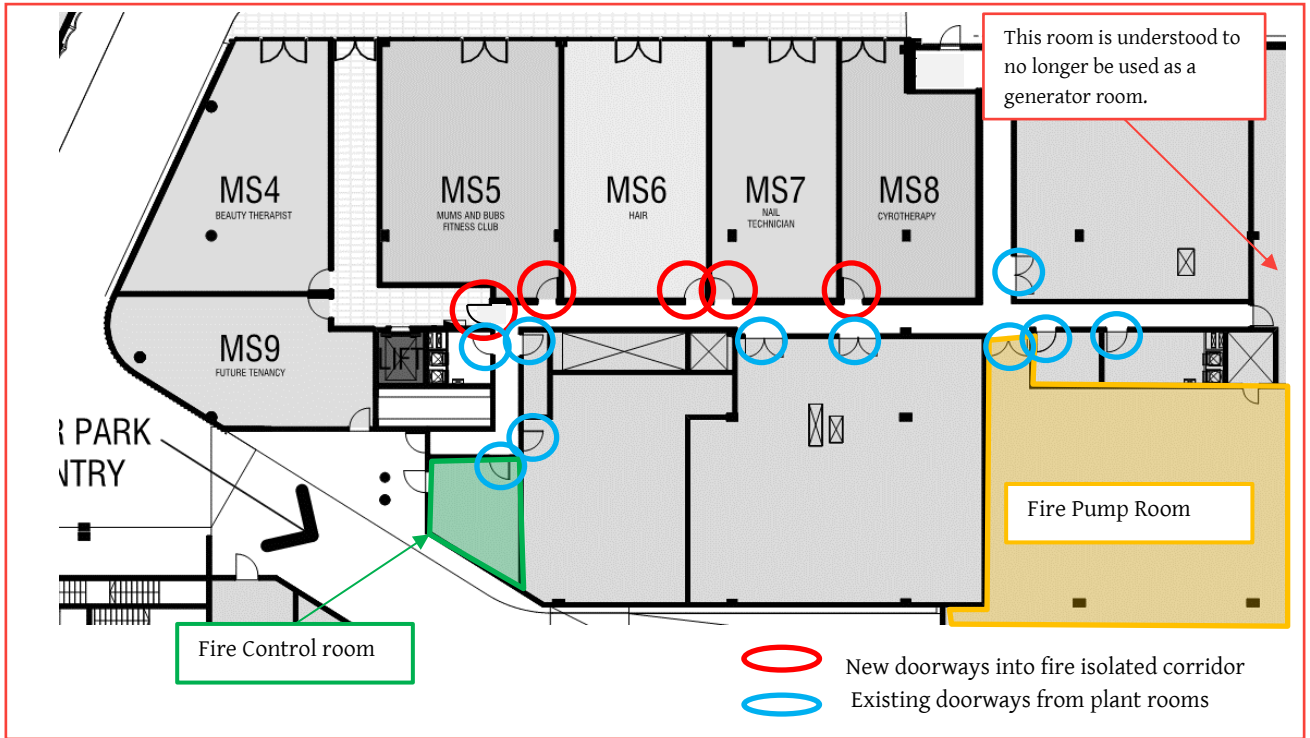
Access doors opening into the fire-isolated corridor on Lower Ground Floor
